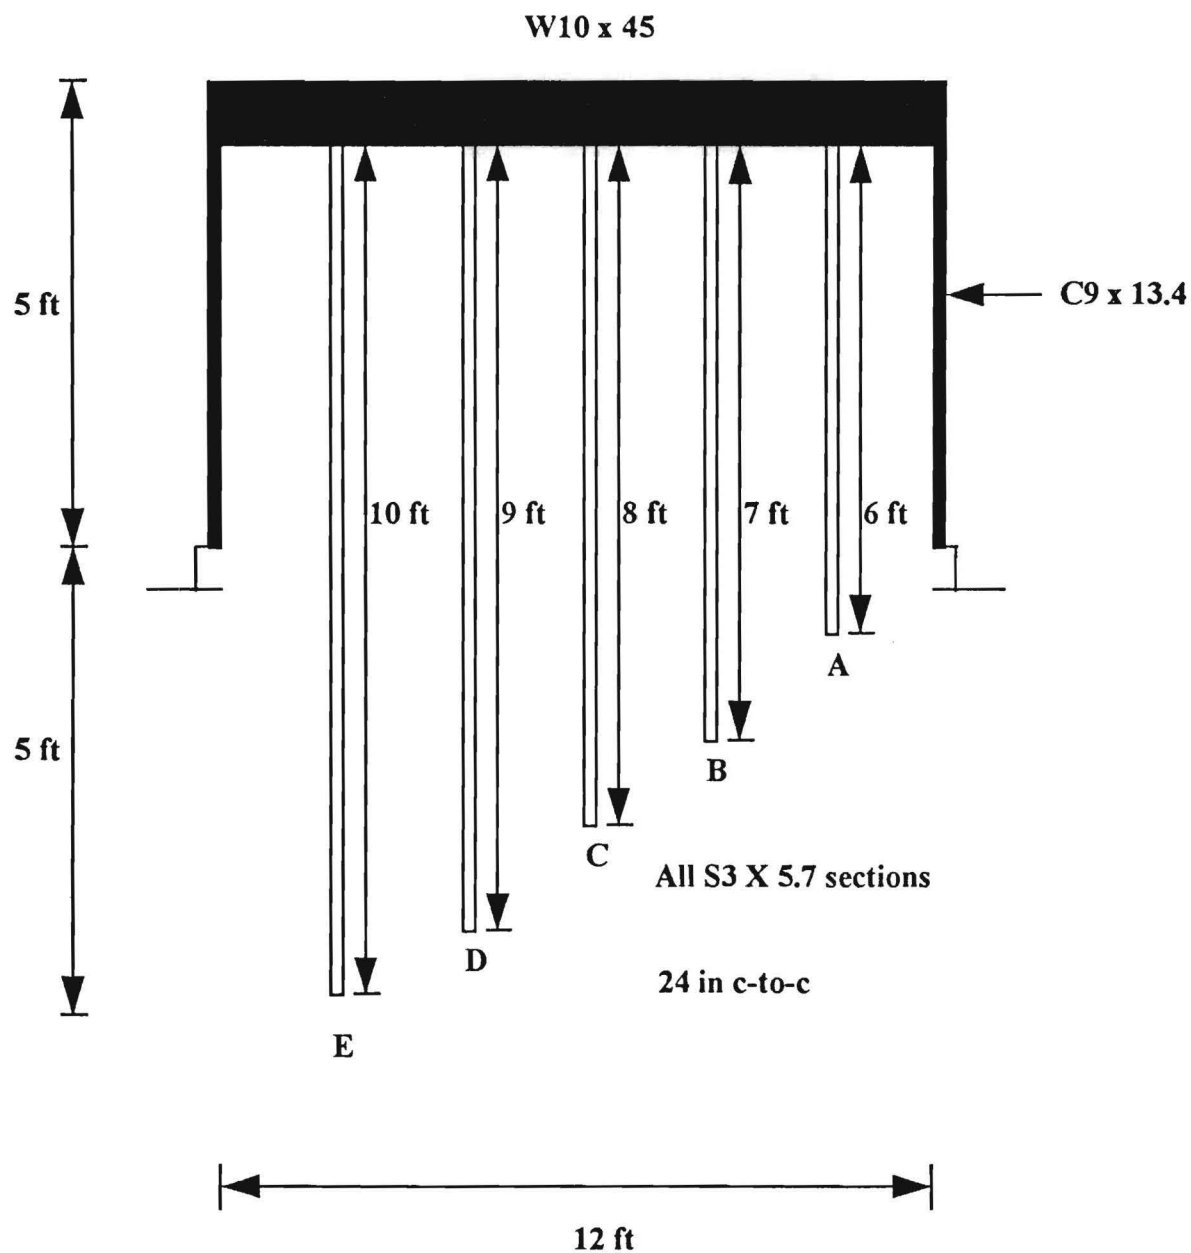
Right Elevation View of Small-Scale Pile Test Facility
